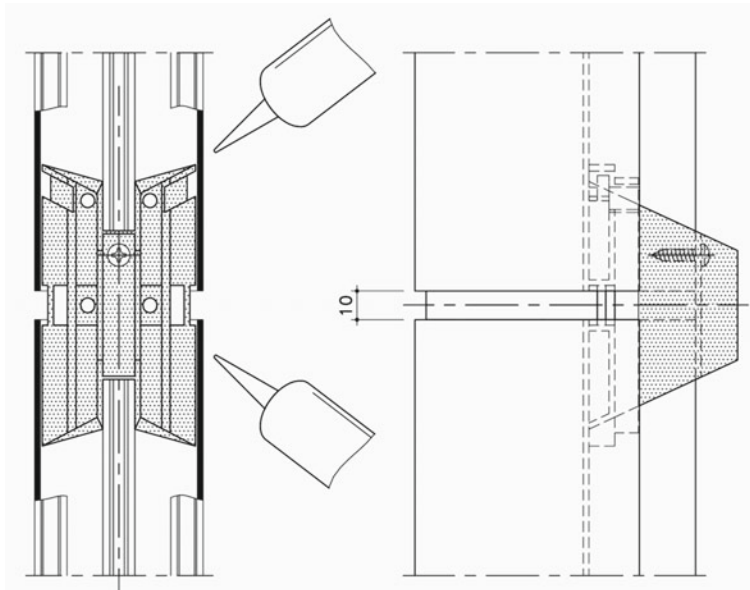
Execution of perimeter fastening joints using silicone adhesive gaskets, determined with respect to the closing interfaces with wedges, joint cover profiles and spacers. © Courtesy of AluK
